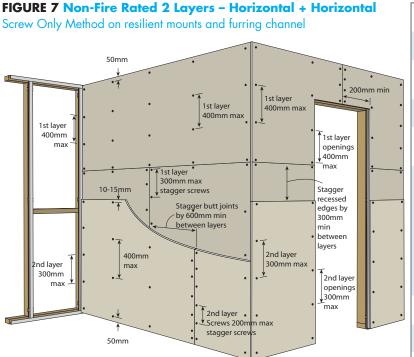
Non-Fire Rated 2 Layers – Horizontal + Horizontal
